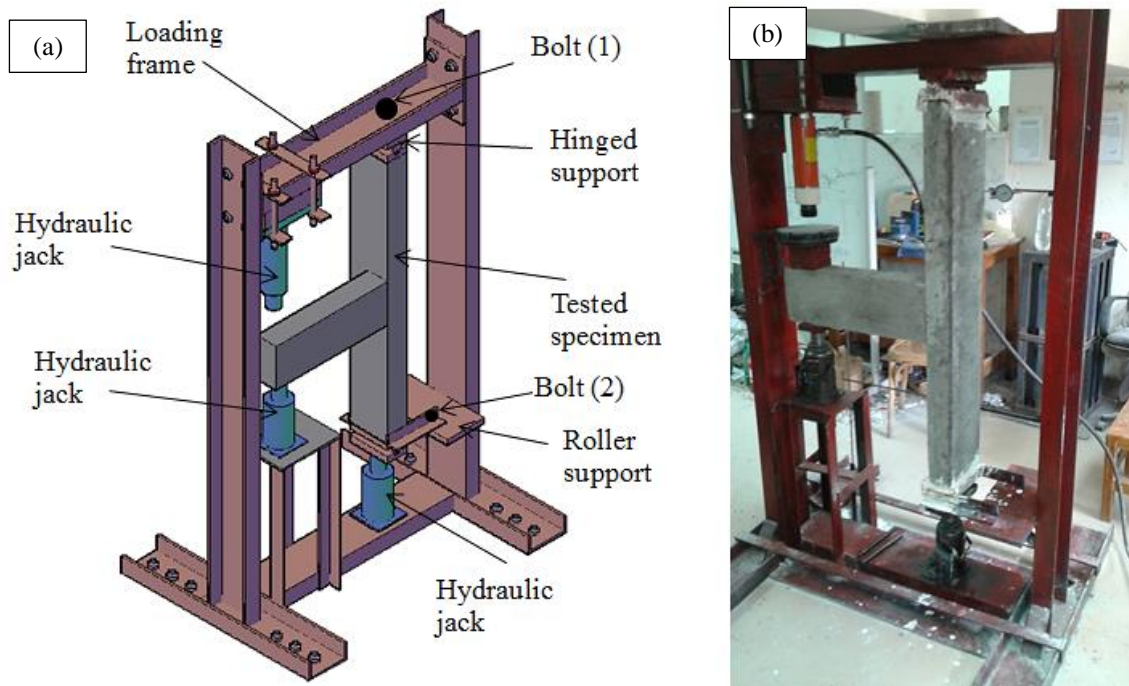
(a) Schematic diagram of the test set-up (b) Actual testing arrangement of the specimen
